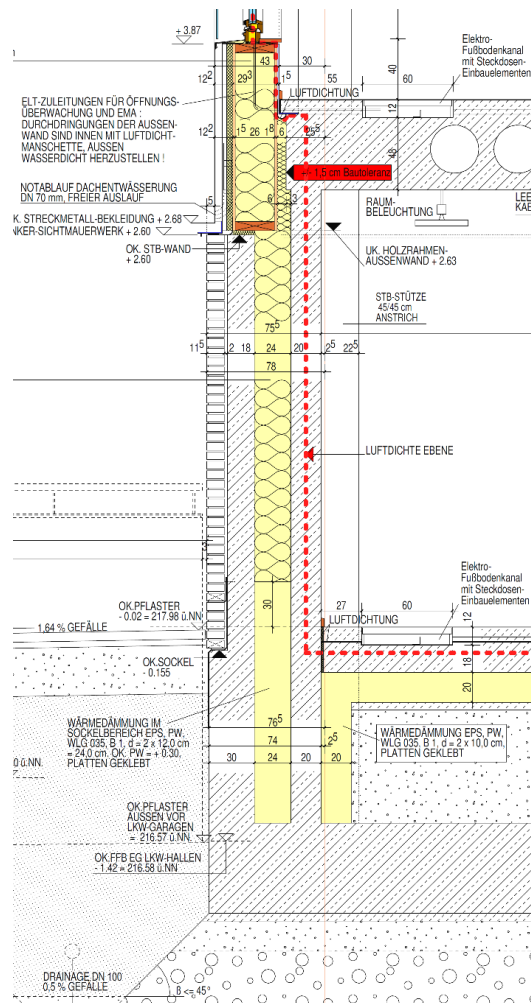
Cross-section showing the base point of the wall/foundation, and the airtight layer as a dotted red line
